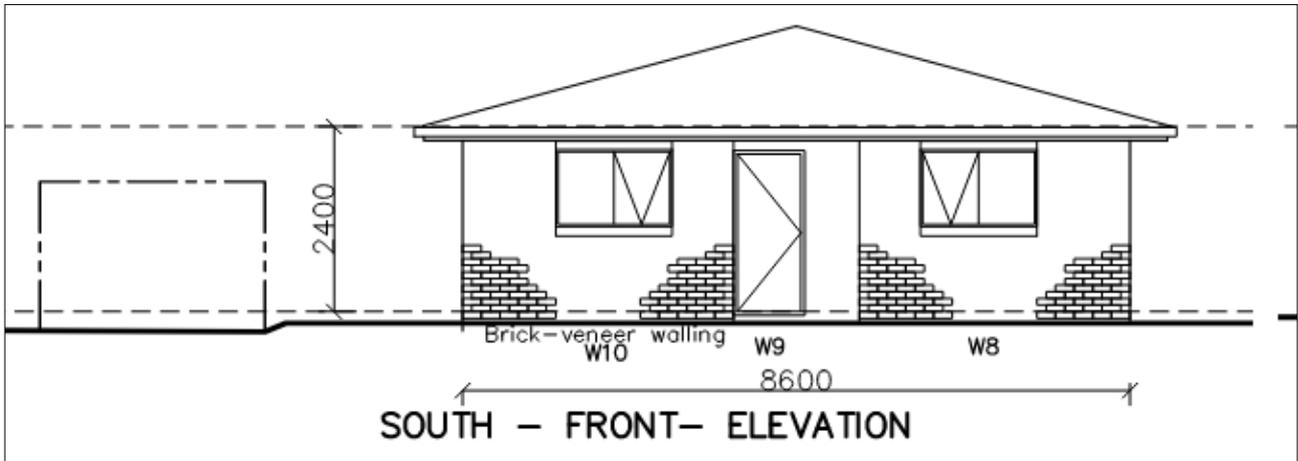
South elevation (road frontage) of single dwelling (Tas Laughlin, 2021)
